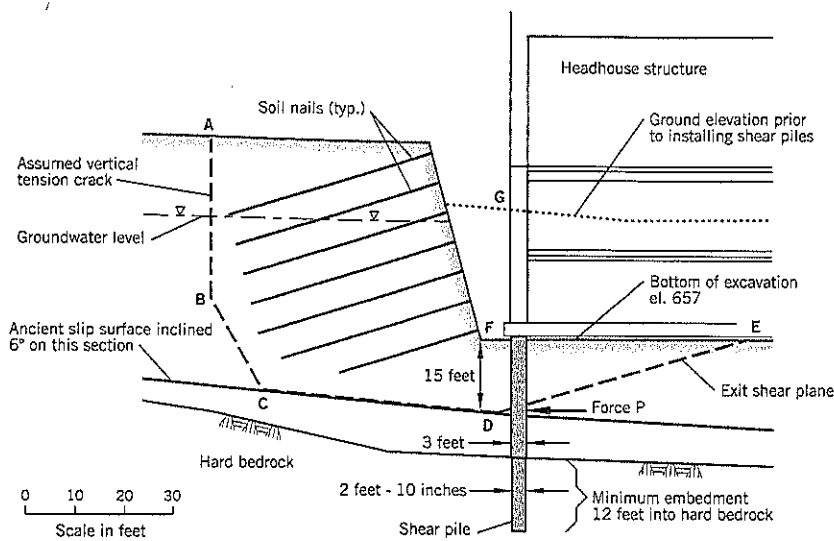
Washington Park Station. Section Y-Y through the middle of the East Pit excavation, showing the stability analysis model.
